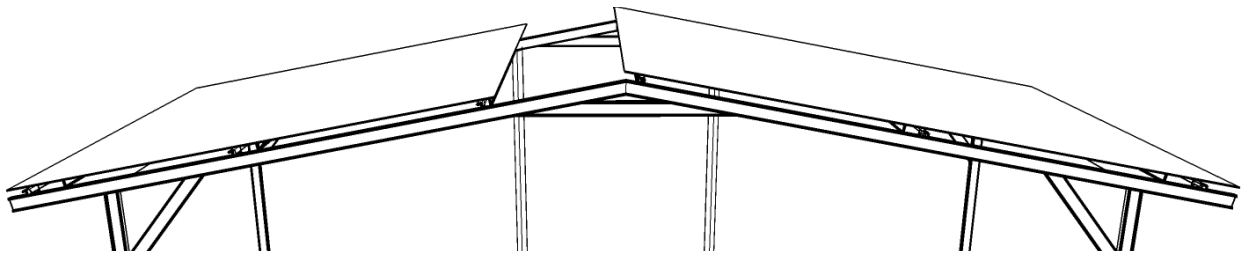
Gap in roof on one side of peak to help with air flow and allow sunlight in. *Source:* Noah Elhardt
